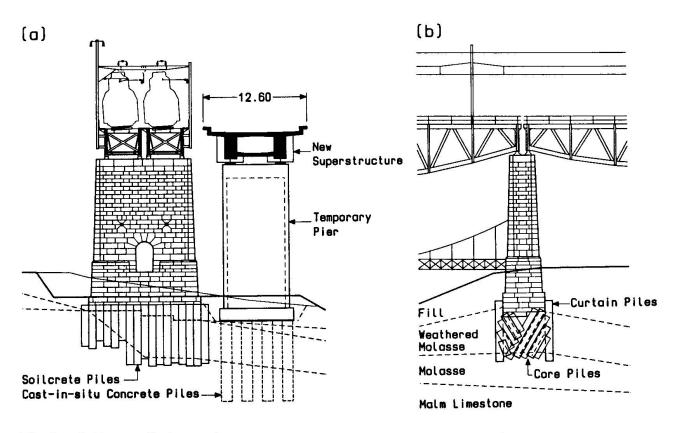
Soilcrete pile foundation of side piers: (a) Cross-section; (b) Elevation.
